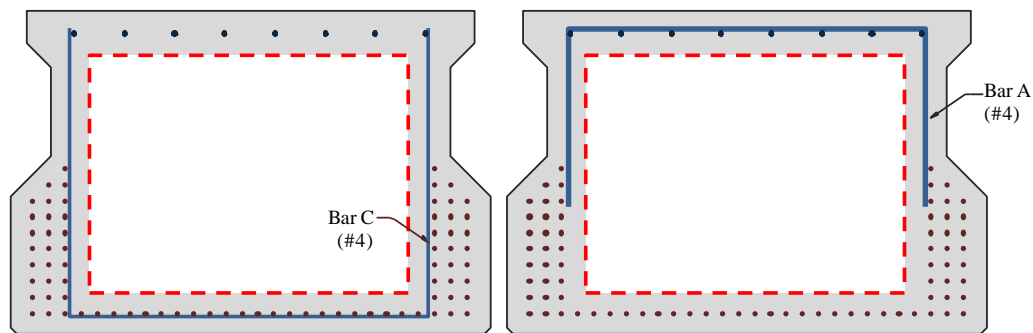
Shear reinforcement bars and strand pattern for 5B40 box beams.
